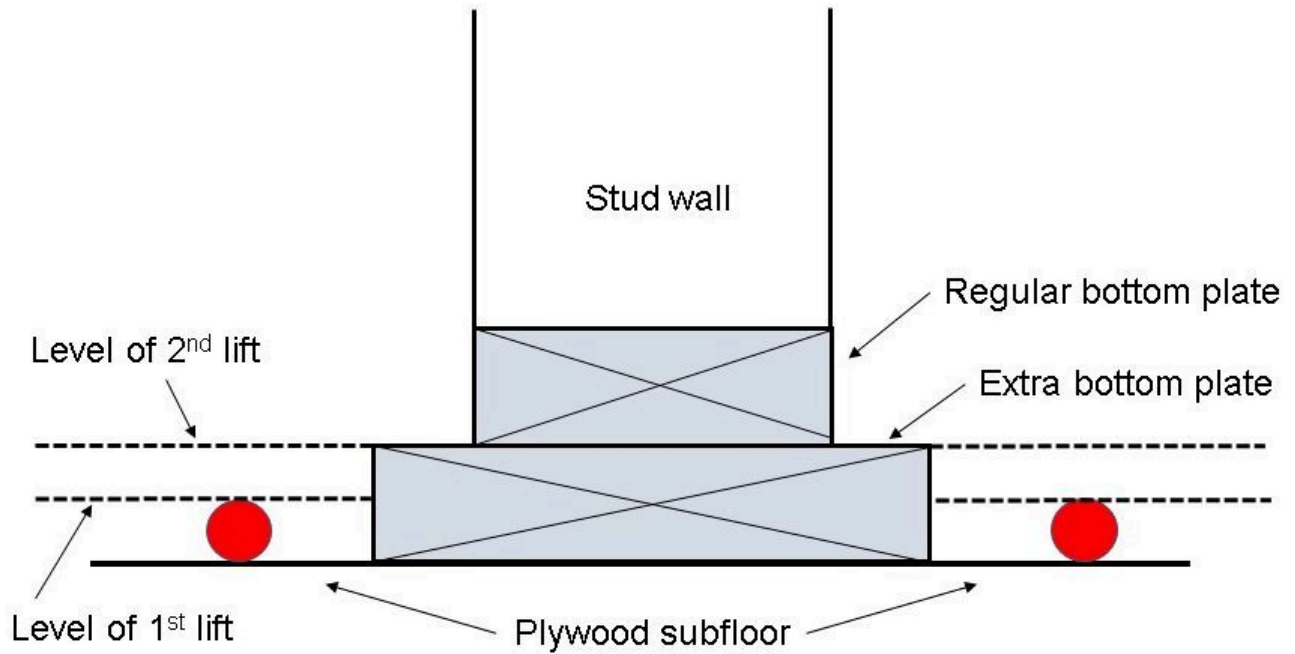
Profile at interior wall of wet slab-on-wood-subfloor system
